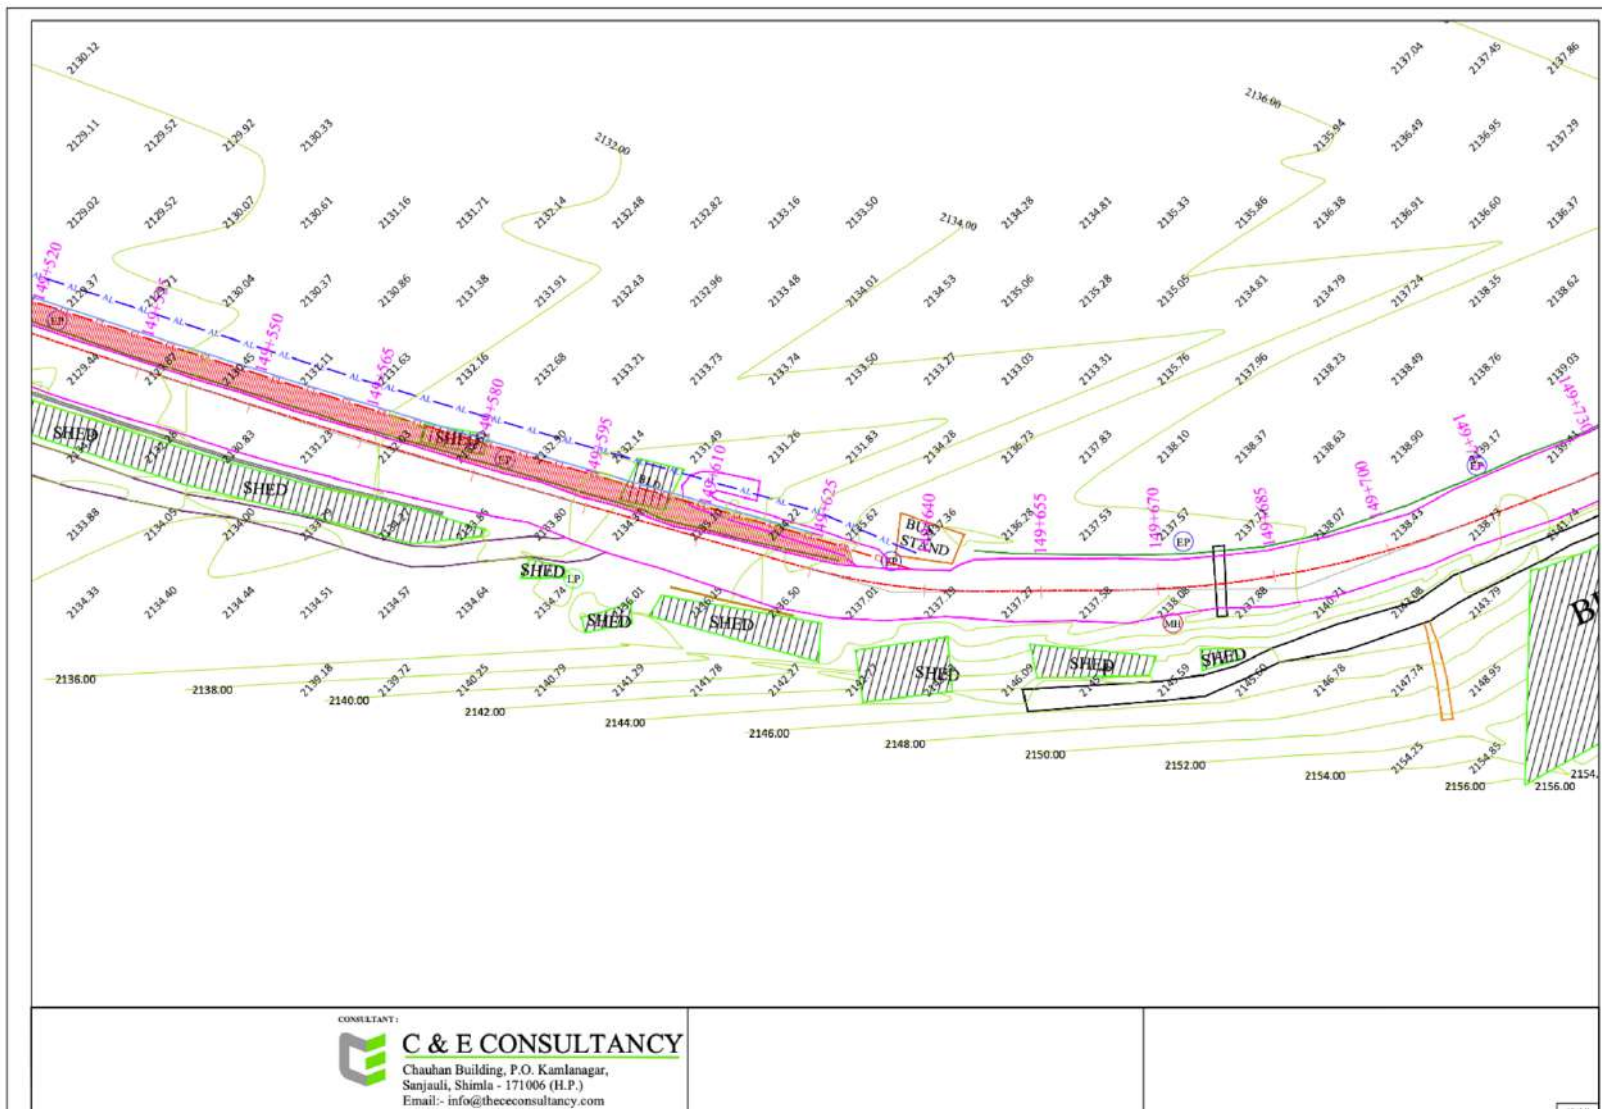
Proposed Road Design for the Improvement of MDR-67 Road Section (Victory Tunnel to Auckland Tunnel) - 10
